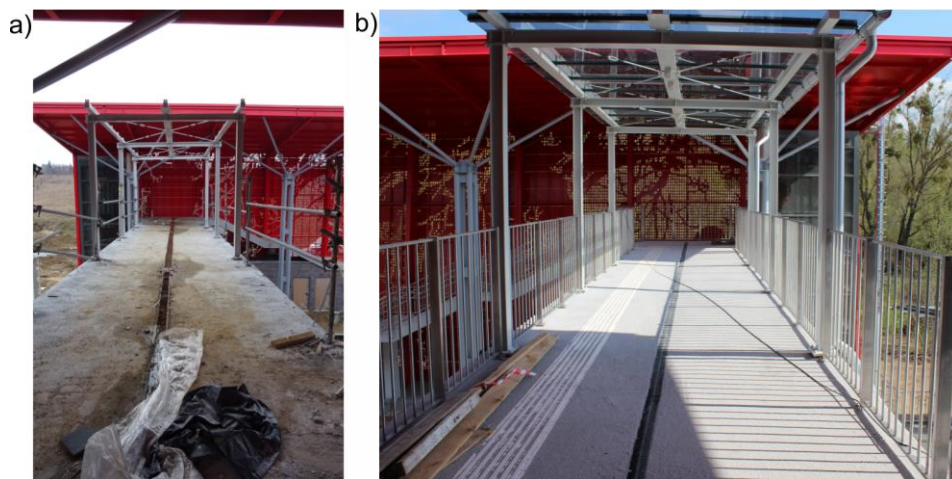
View on bridge deck: a) during construction (Survey #1) and b) two months later (Survey #2)
